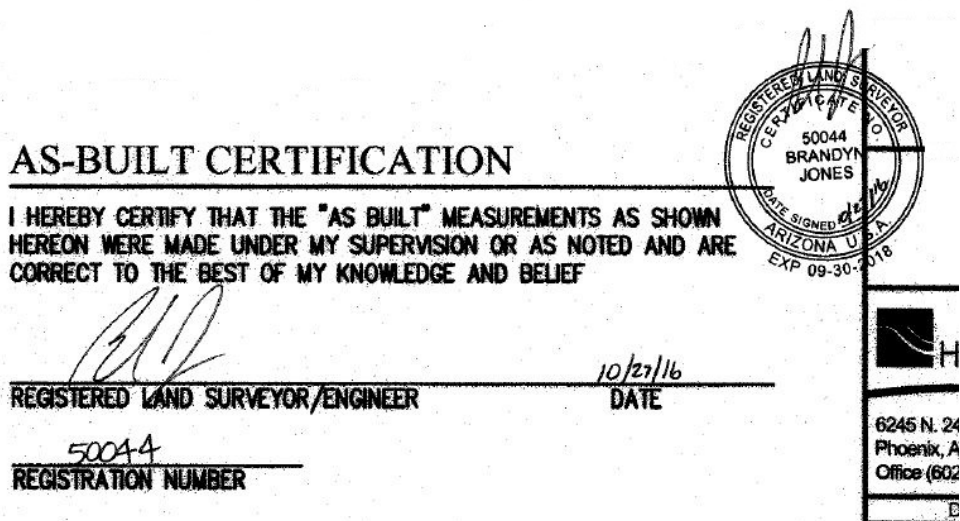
As Built Certification included on the Gallery Improvement Plan As-Built Drawings.
